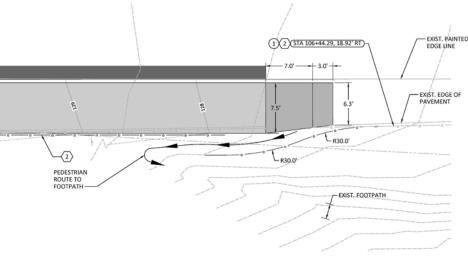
An excerpt from current draft plans by WSP USA acknowledge existing trailhead by allowing for a gap in the guardrail.
